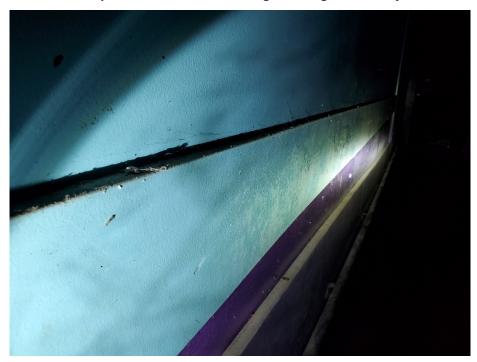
Representative view of surface AMG on back area corridor on ground floor.
